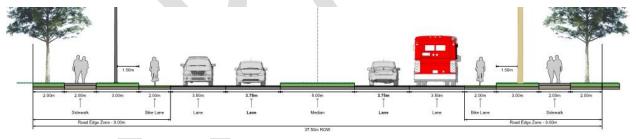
City of Ottawa Arterial Road Concept 1 - Current Cross-Section Standard
